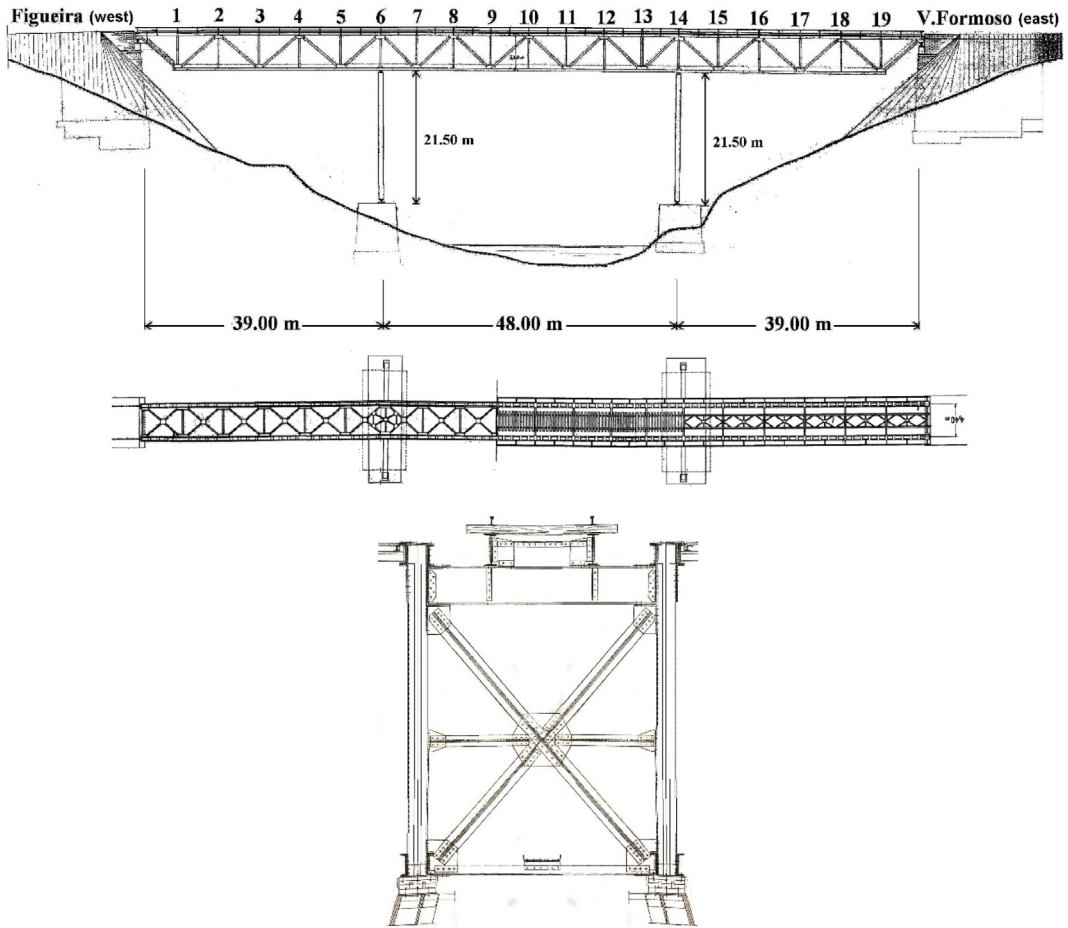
Elevation, plan view and cross section of the Trezói bridge.
